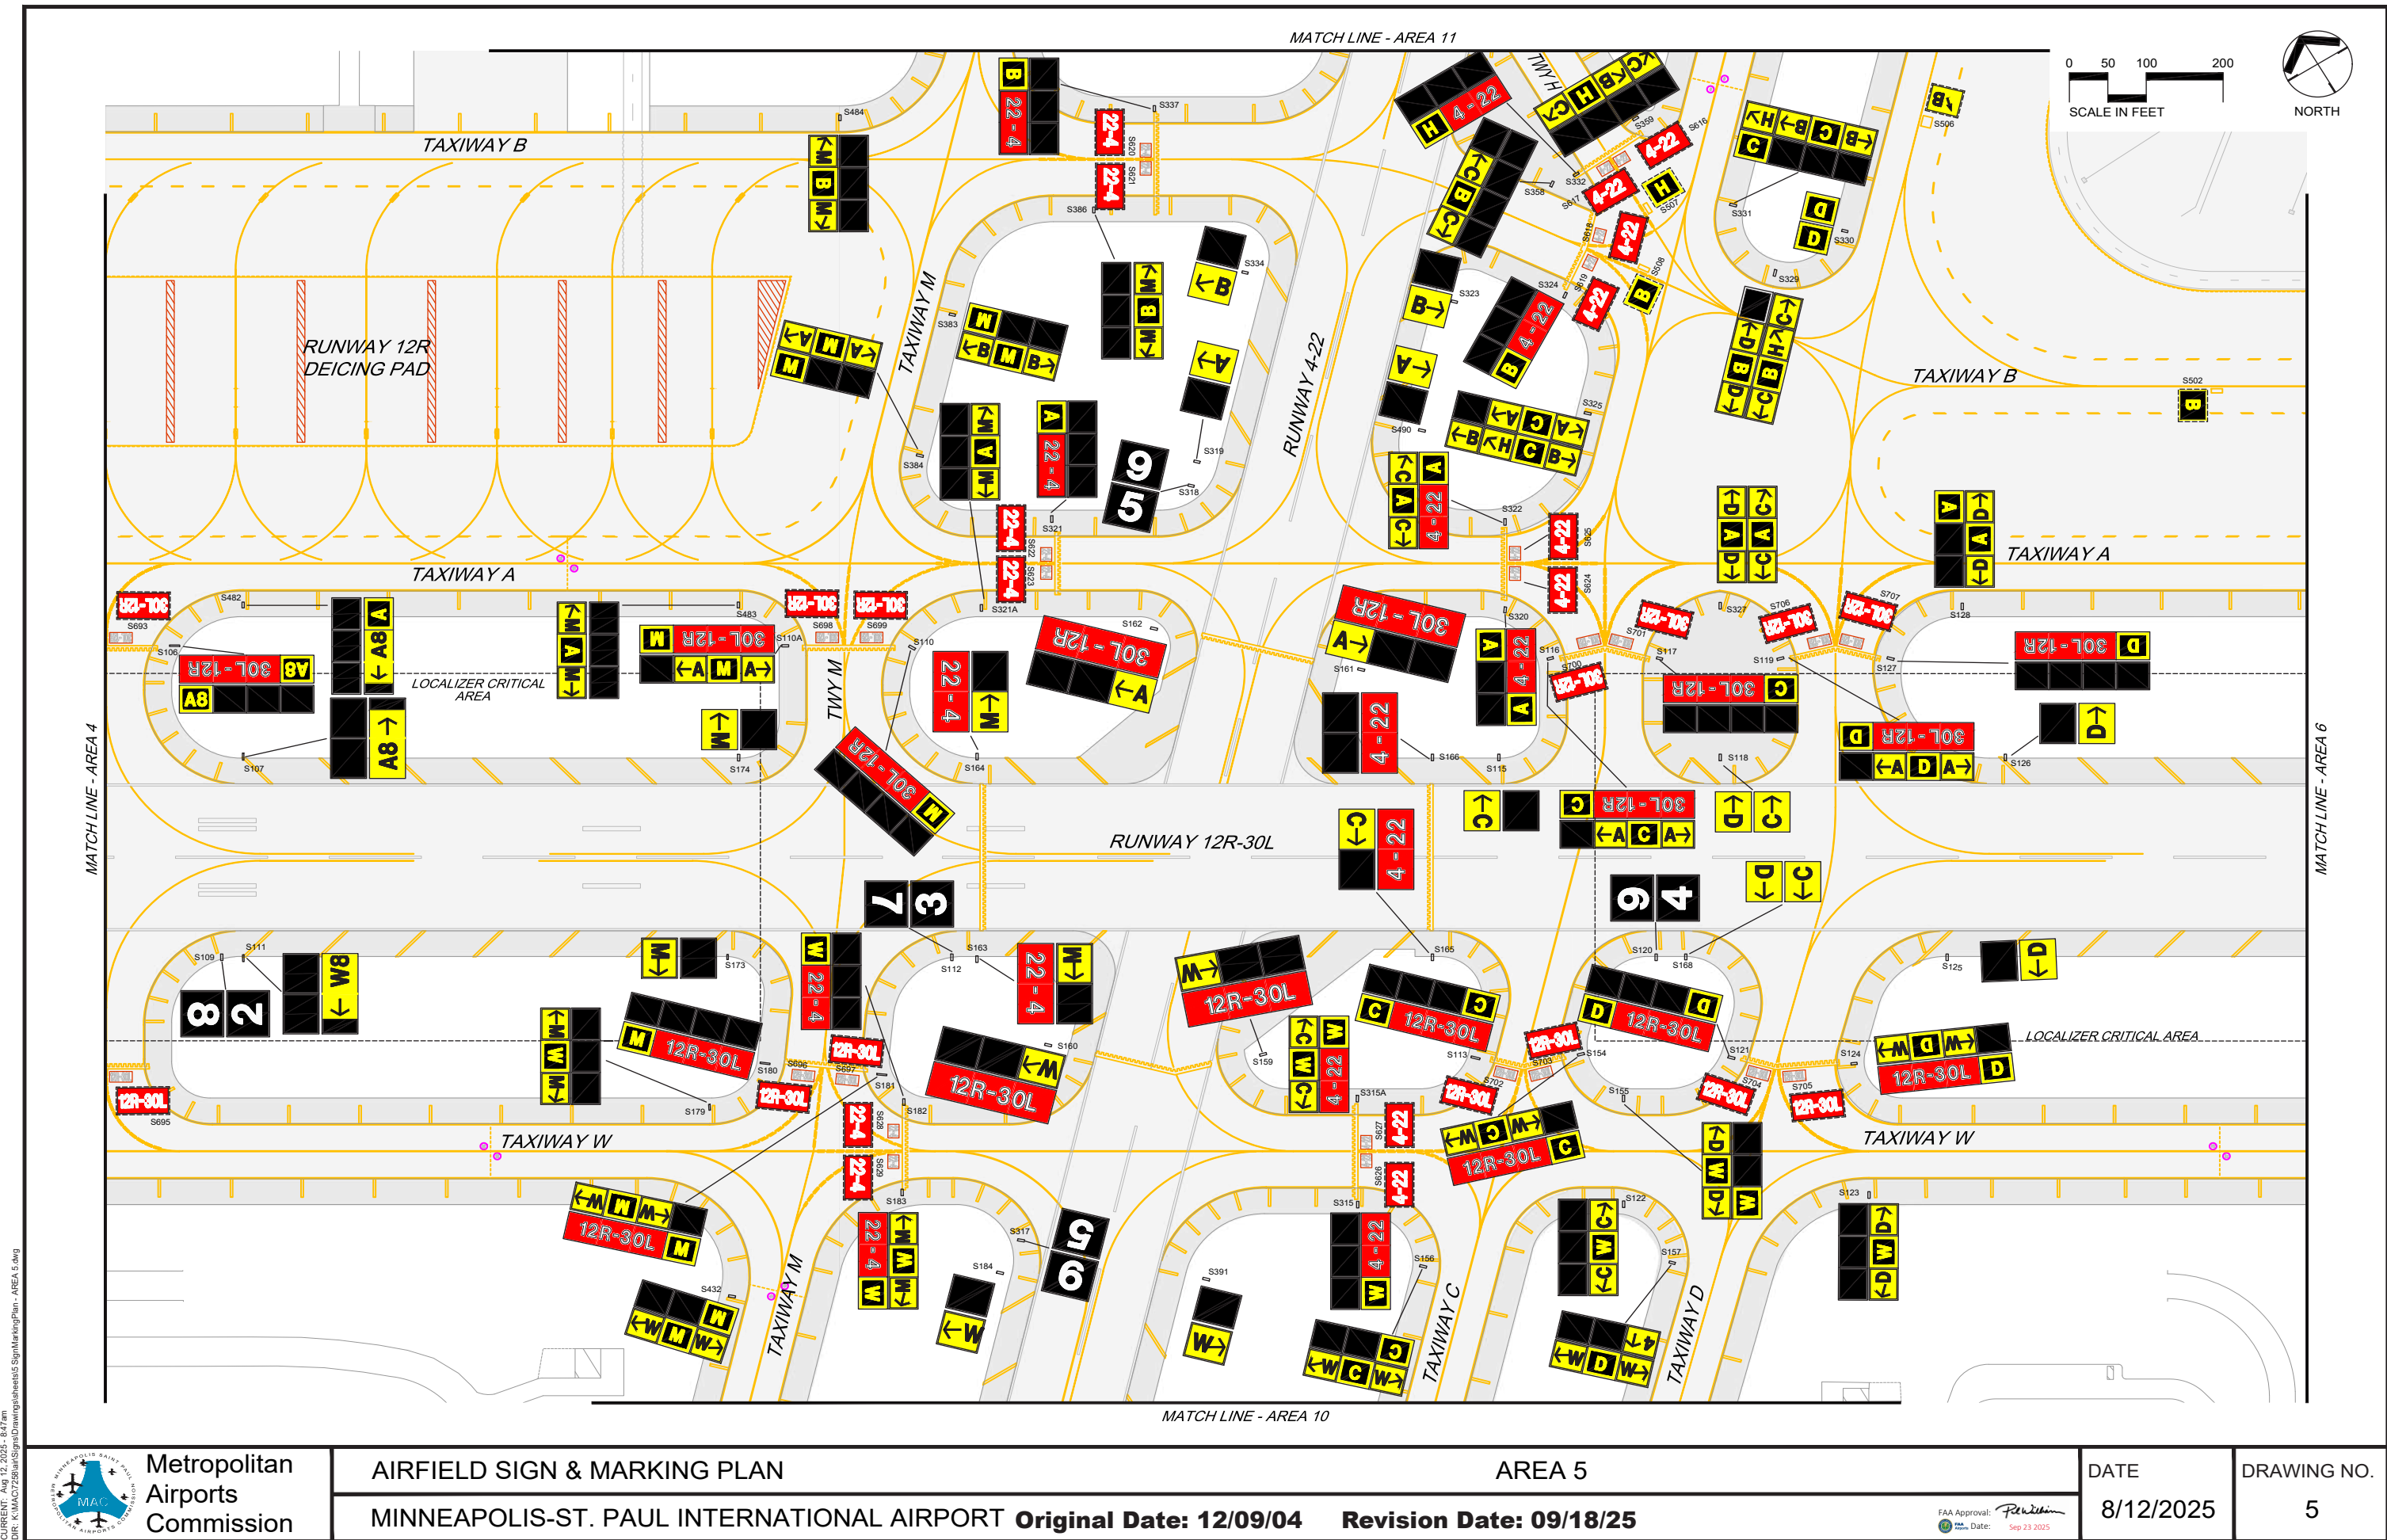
AIRFIELD SIGN & MARKING PLAN
